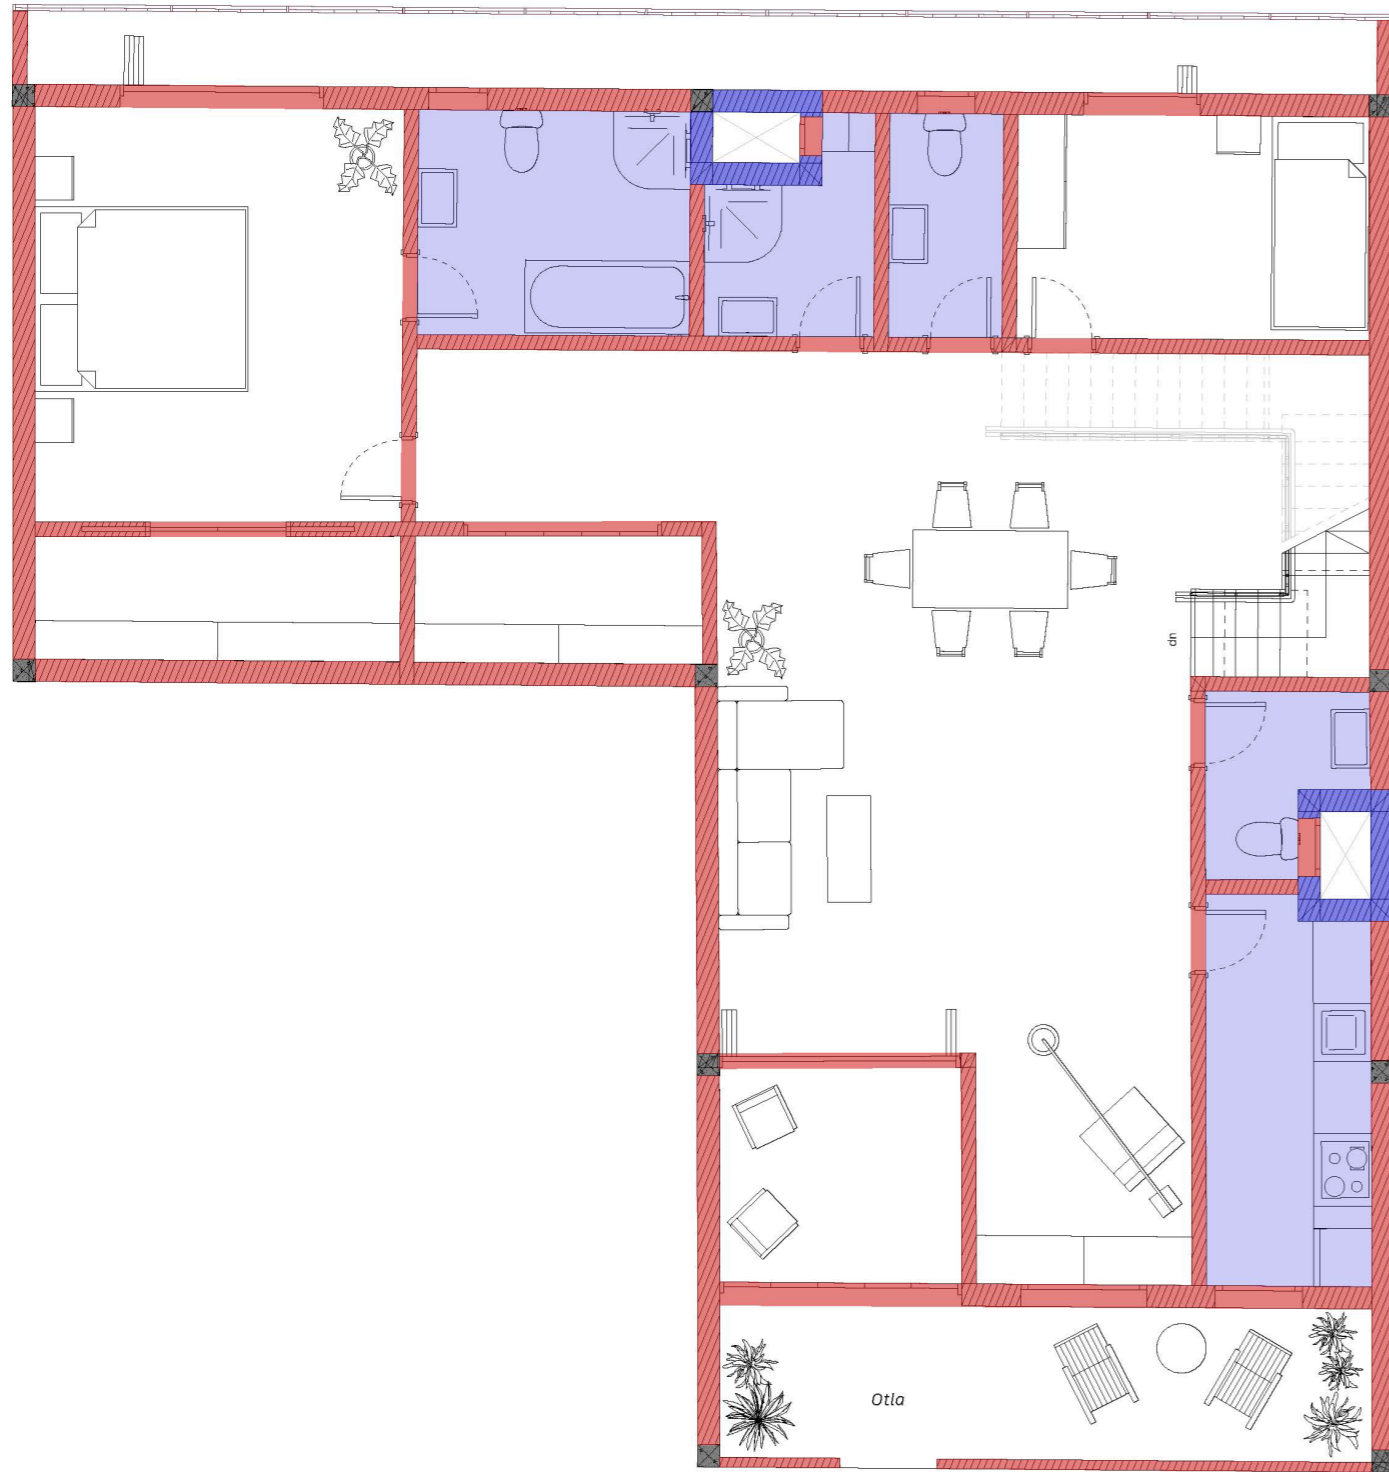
, Groundfloor of a type C apartment (author's work, 2026)
